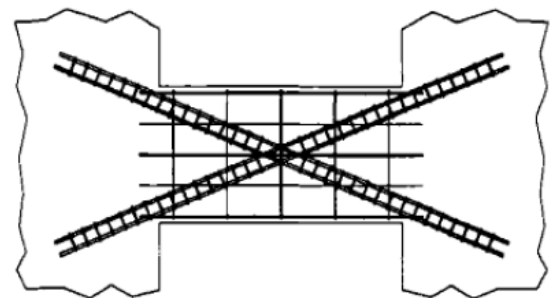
Typical Layout of Diagonally Reinforced Coupling Beam
